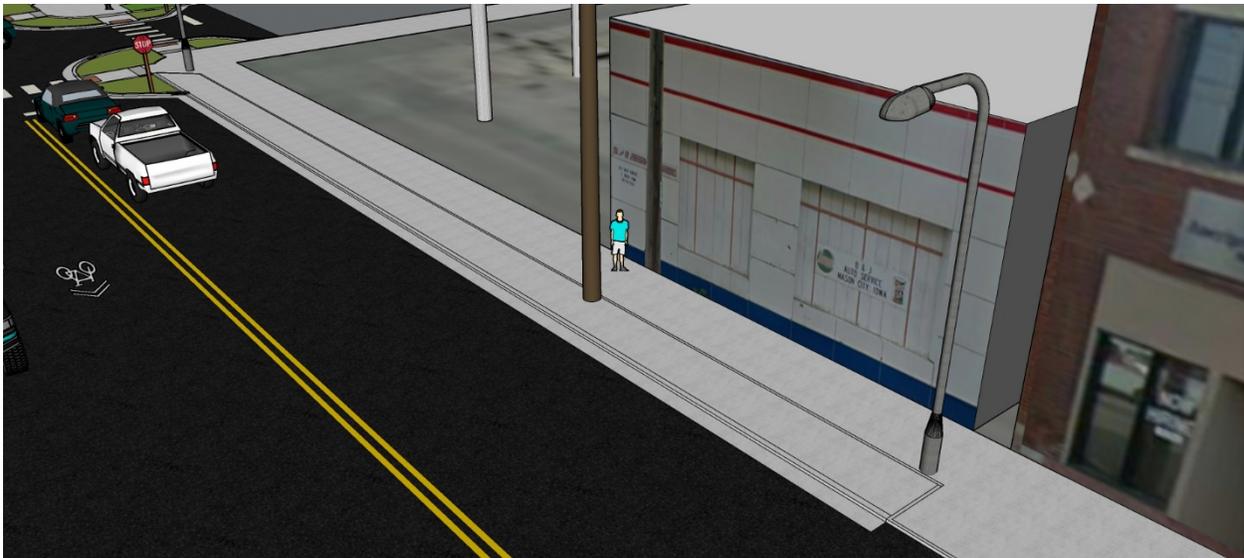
Curb filled in along Pennsylvania Avenue south of East State Street showing a new sidewalk surrounding the utility poles.
